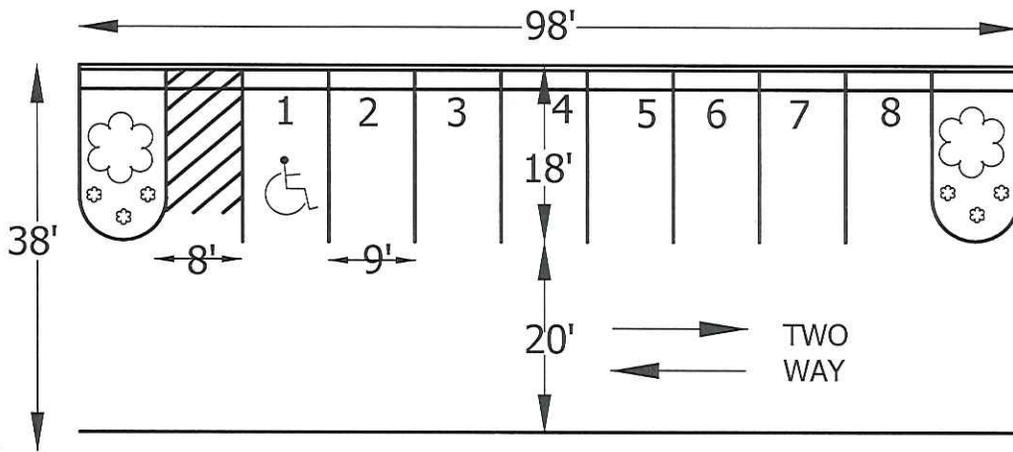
A parking lot of equivalent size to Figure 1, with two (2) landscaping islands as required by the Parking Lot Landscaping Requirements Section 10-3-30.1(5) and eight (8) 90-degree parking spaces.
